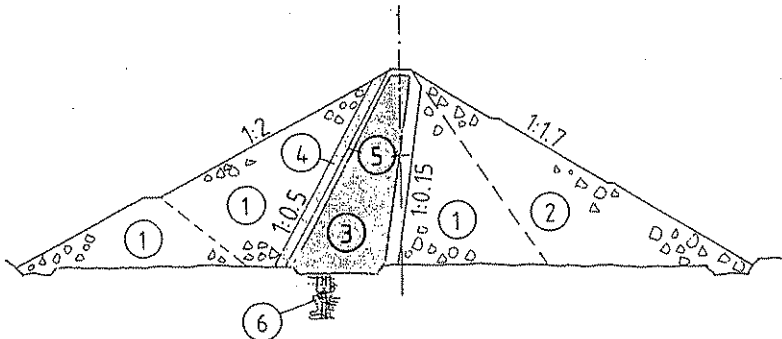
Typical section of a rockfill dam with inclined earth core (scheme).
